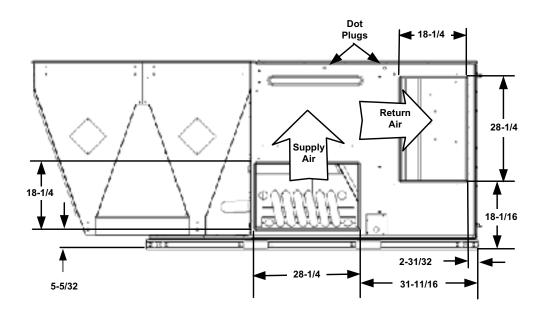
SIDEFLOW DUCT DIMENSIONS
